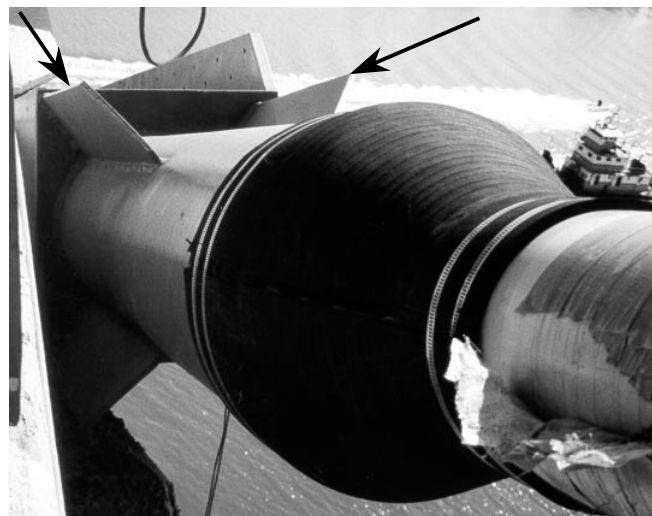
Failed Connection of Guide Pipe to Anchorage Box
